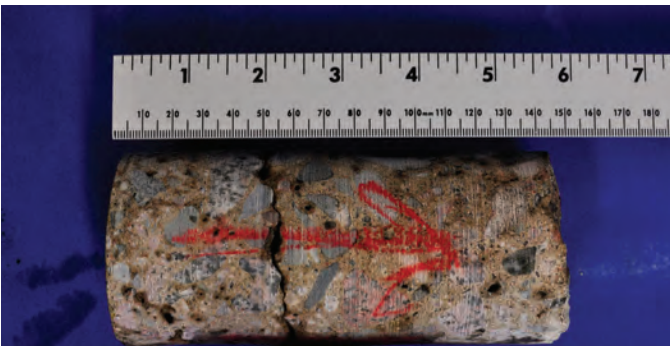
Extracted core from rectangular foundation showing concrete delamination
